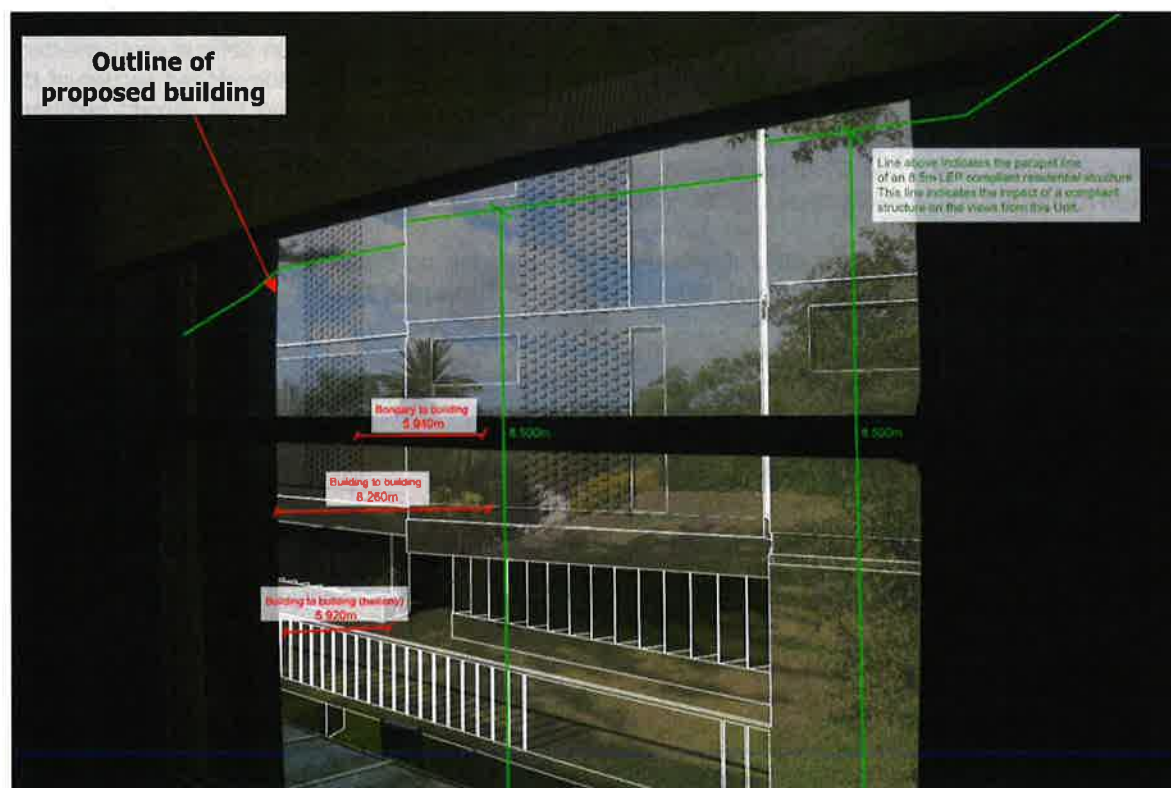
'View 7' from Bedroom of Unit 4, 29B Shirley Road
